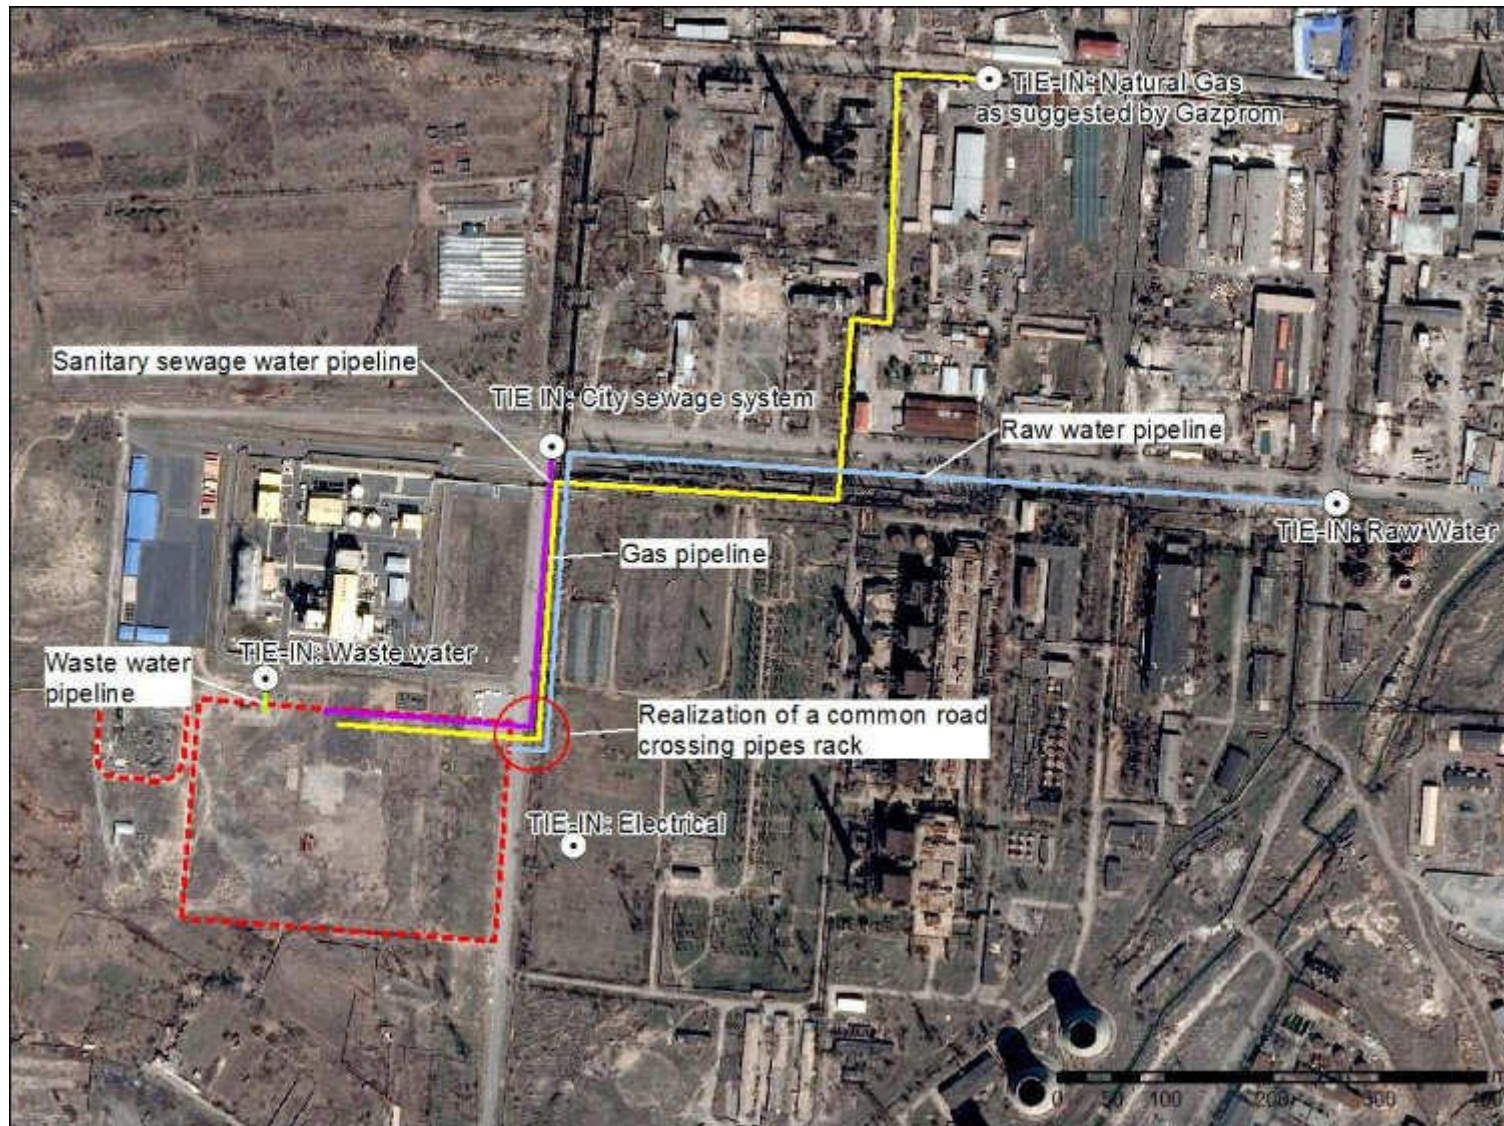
Overview plan showing the new interconnections of YCCPP-2
